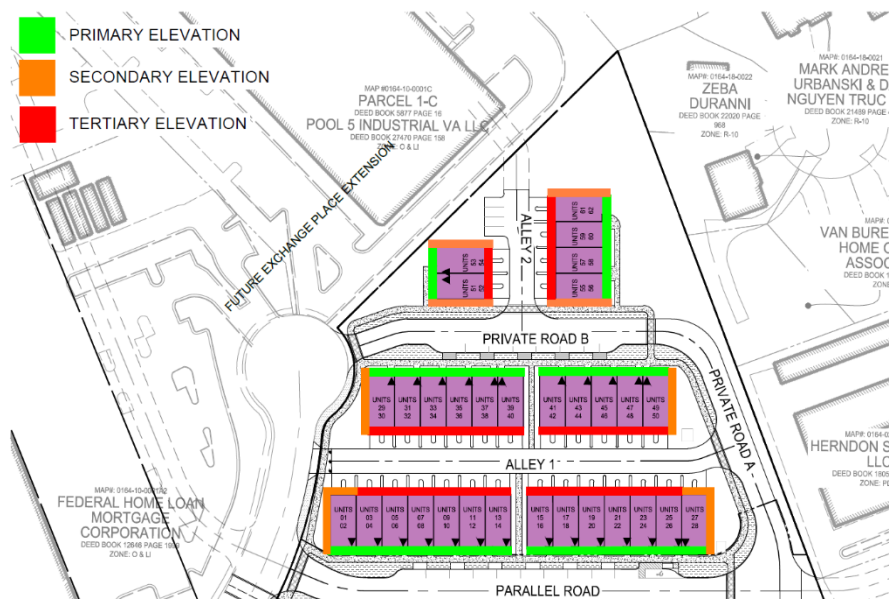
Diagram showing elevation type included on page 15 of the Stacked Townhouse Design Standards.
